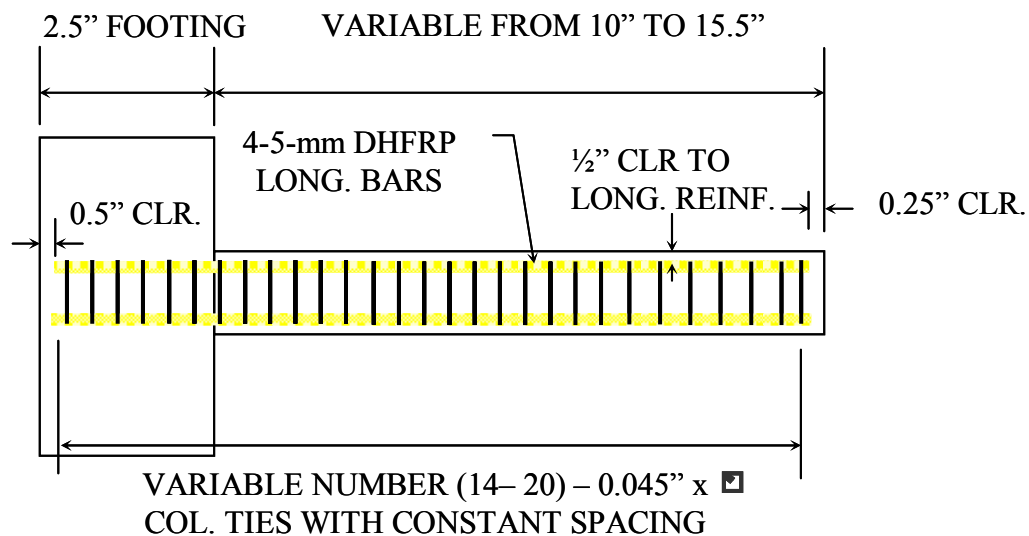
Reinforcing Details for Model DHFRP R/C Columns.
